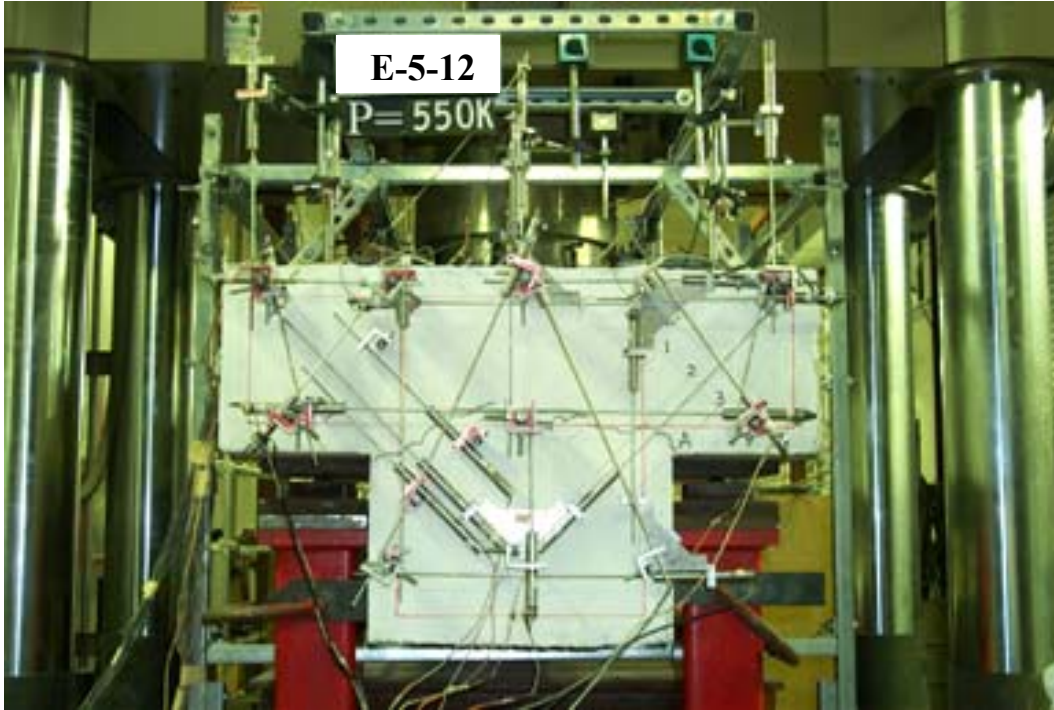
(g) Horizontal cracks in Specimen E-5-12
